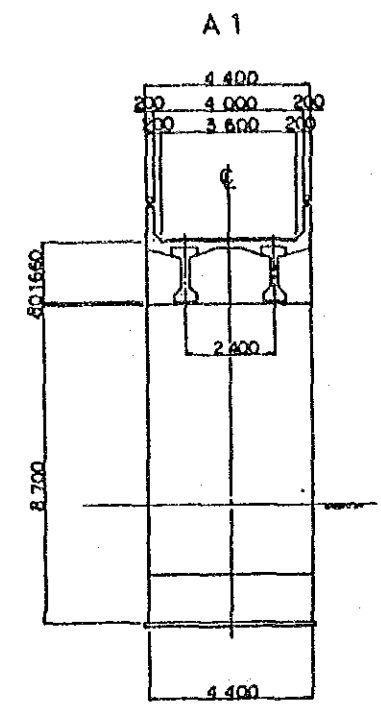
General Layout Plan of the No.17 Peer Baba Bridge
